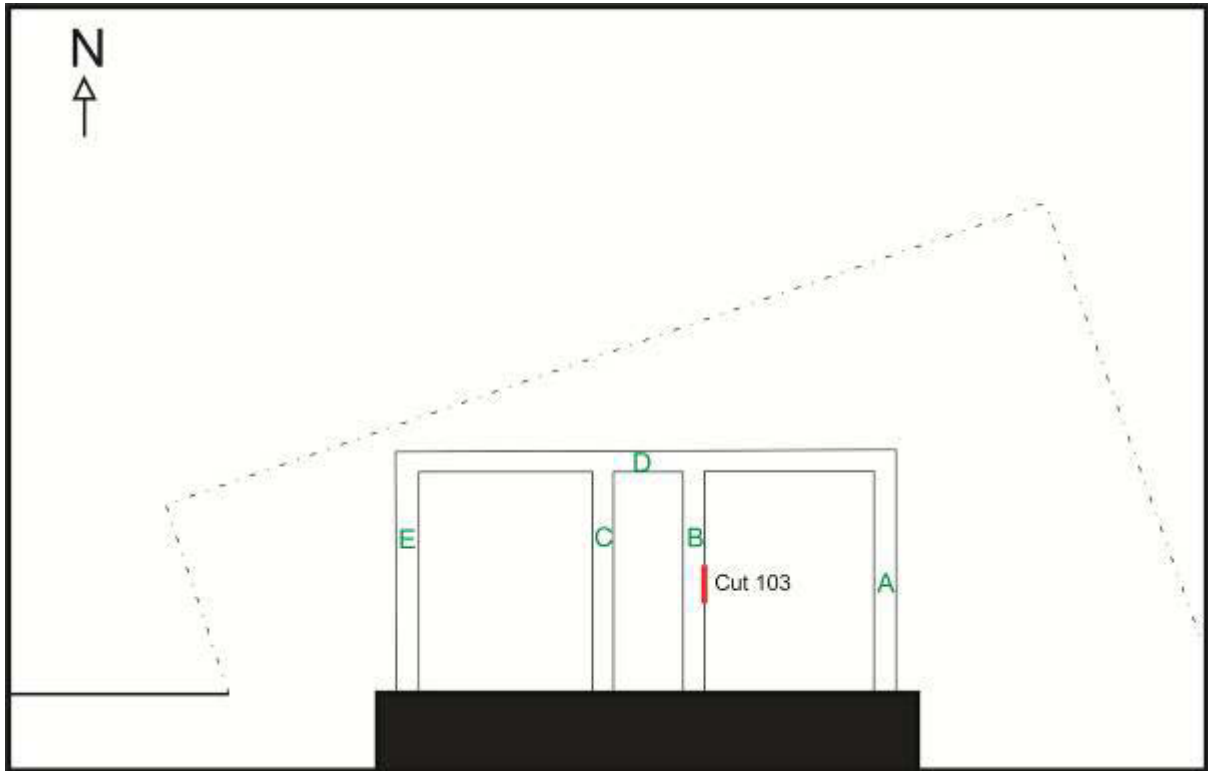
Site plan showing excavated foundation trenches (as labelled in text) and location of single cut feature (103). Existing house in black, chain dot line shows site boundary (Scale 1:200 based on supplied architects drawing)
